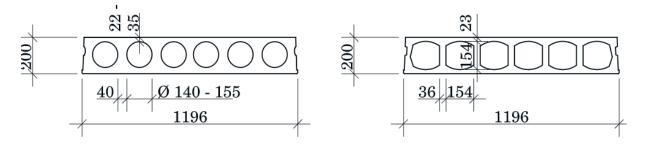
Different shape of cross-section in hollow core slab [2]
